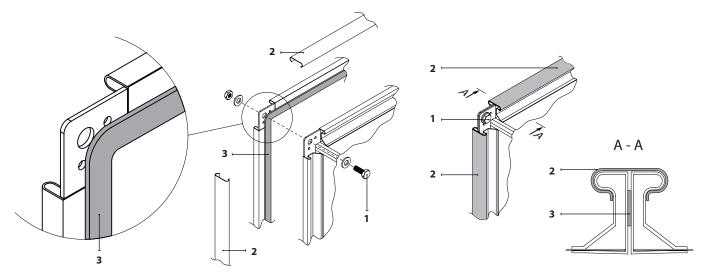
Example for fastening and sealing of a flange ductwork connection 1 – screw, 2 – C profile for connection of flanges, 3 – adhesive gasket
